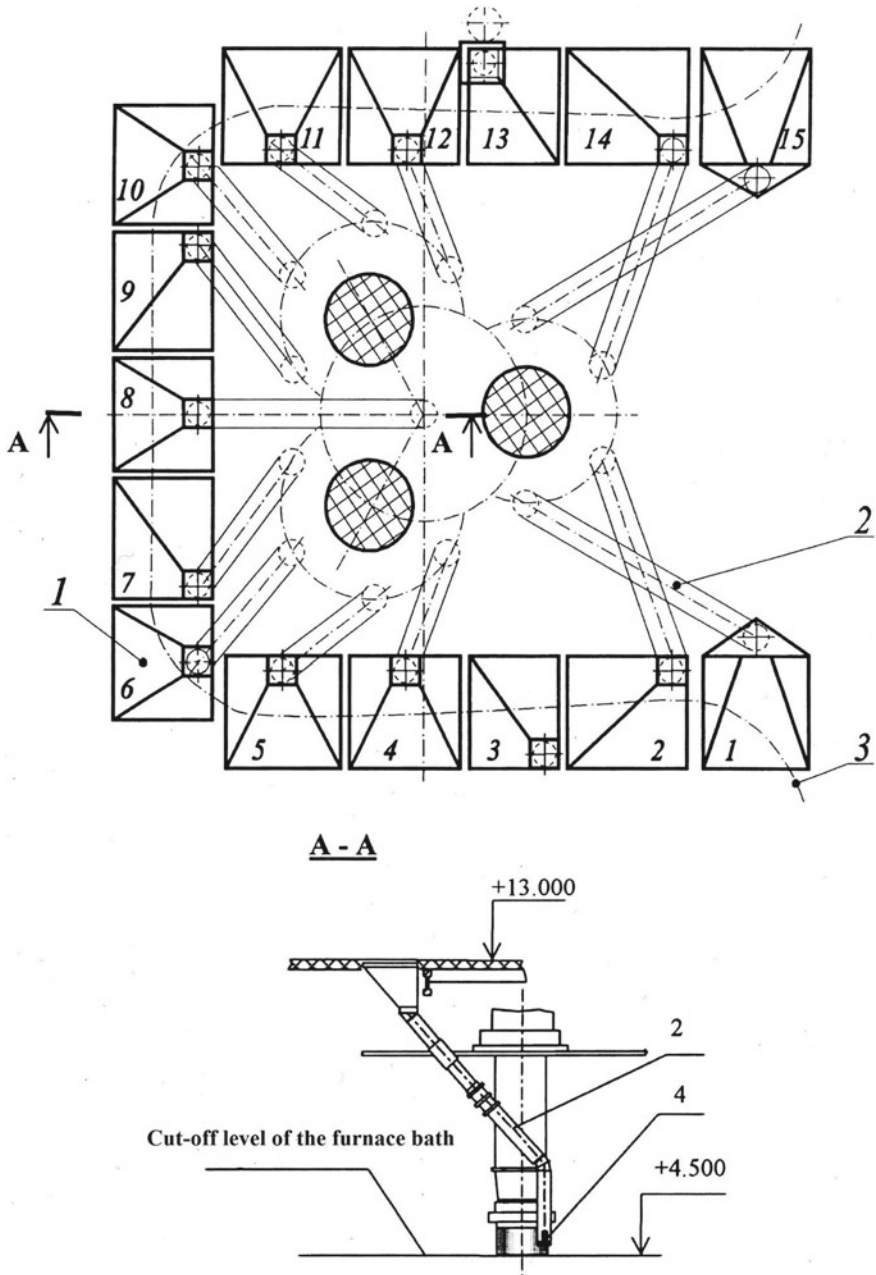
Scheme of loading an open furnace with pipe-chute, 1—furnace pockets; 2—water-cooled shaft tubes; 3—transfer mono-rail trolleys; 4—pipe-chute protection
